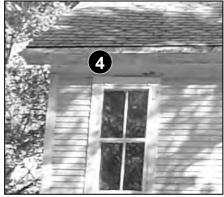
220 Silver St. The original copper eave flashing still remains along the edge of this roof.
